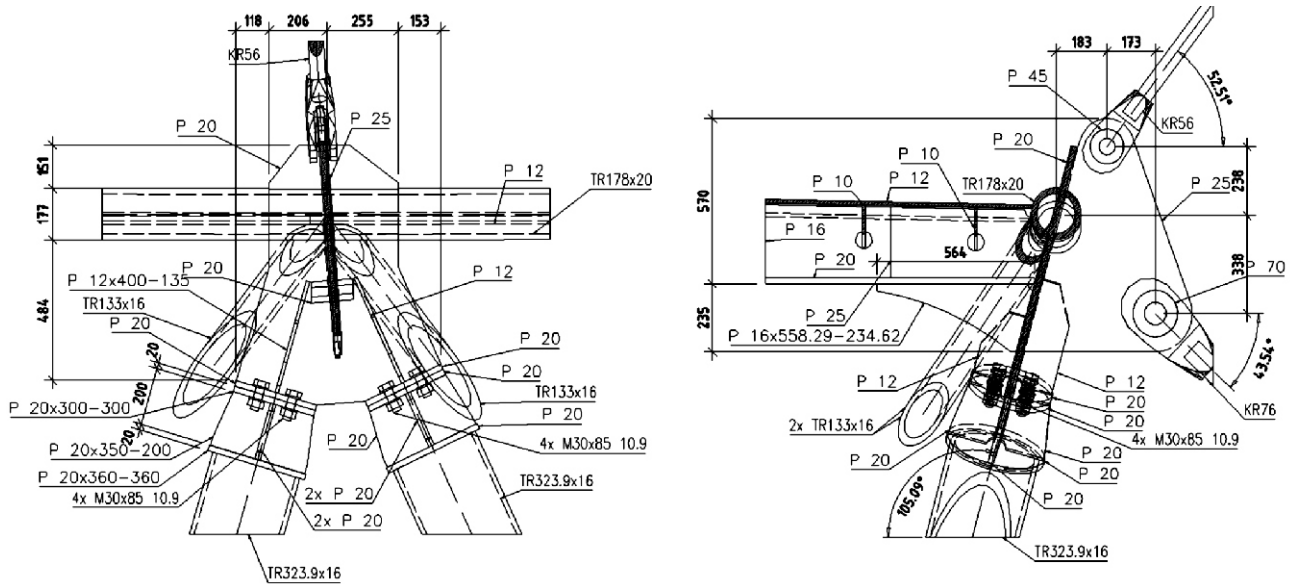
Detail of the connection between the stiffening girder and branch of tree support in location of transverse bracing
